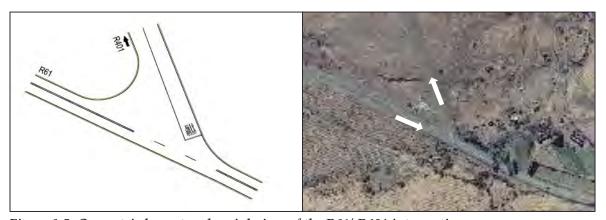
Geometric layout and aerial view of the R61/R401 intersection
